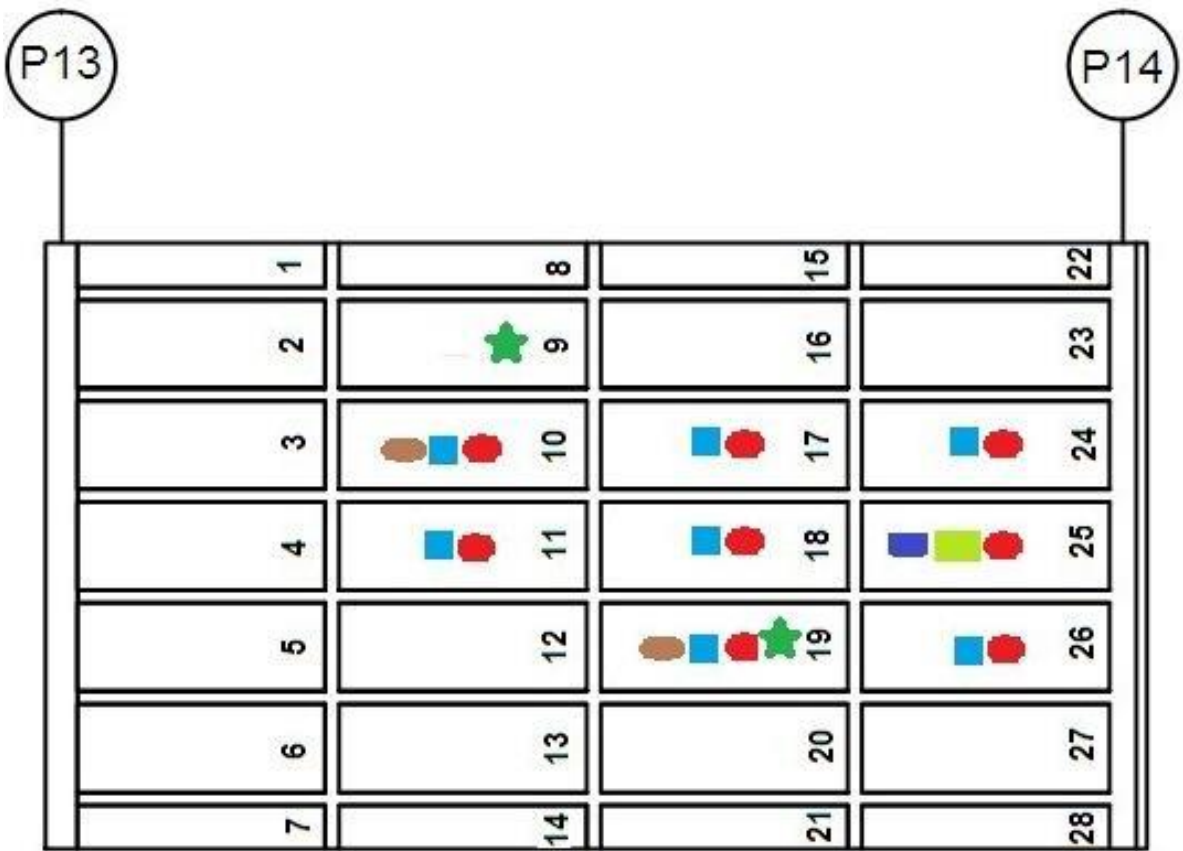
Test conducted at various locations between Pier P13 and Pier P14
